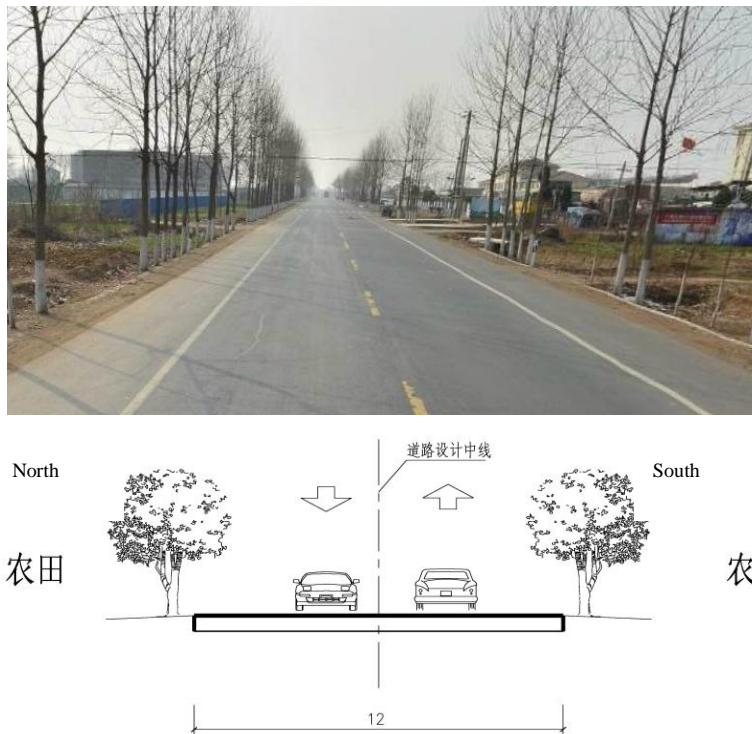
Existing Section of Yinxing Avenue (Fucheng Avenue ~ Handan Railway)
